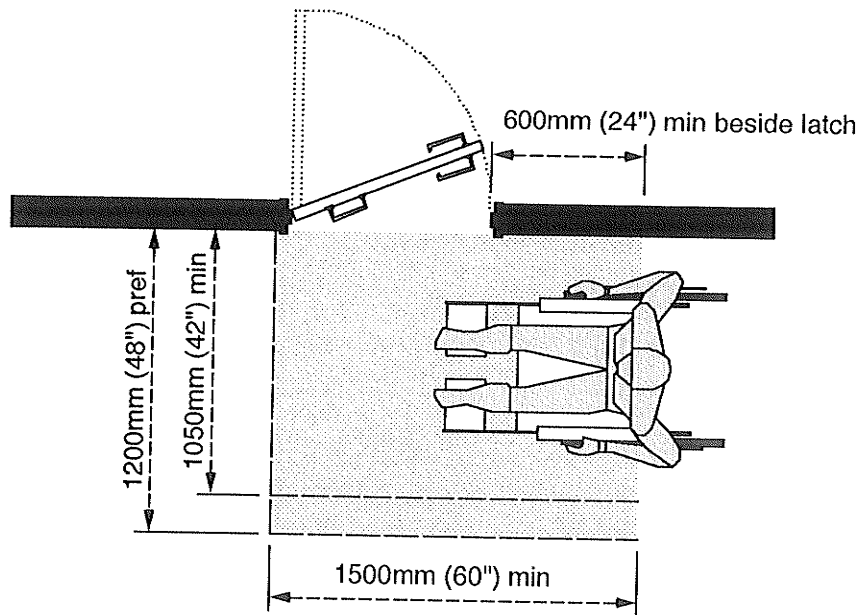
Minimum Doorway Maneuvering Space, Side-hinged Door, Latch Side Approach, Push Side
